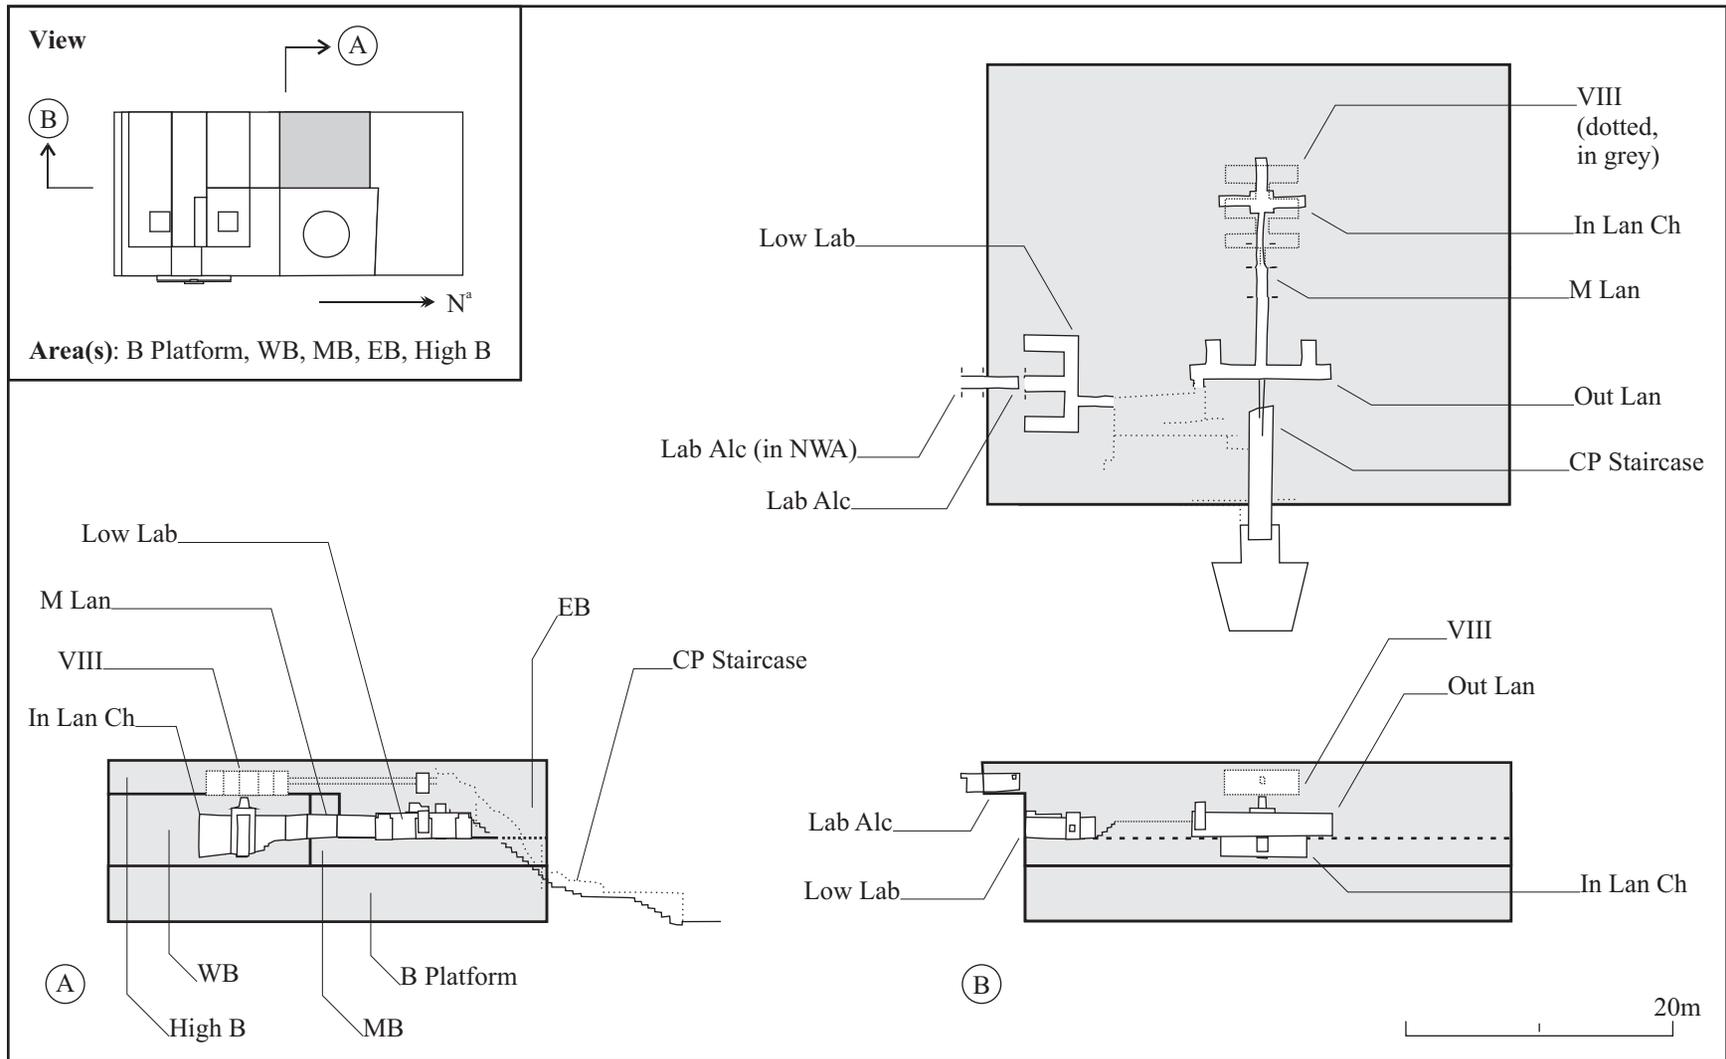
Building B area and galleries. Circular Plaza Staircase (CP Staircase) not shown in view (B).
